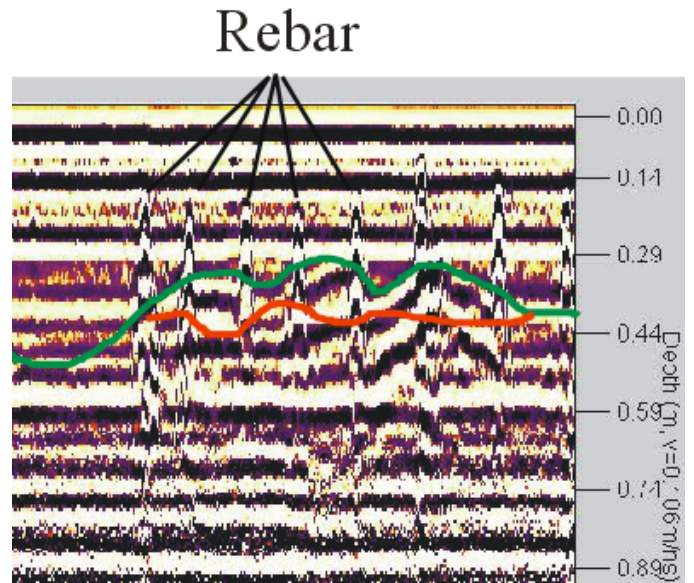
Section of tunnel with heavy density of rebar / roof support bolts.
